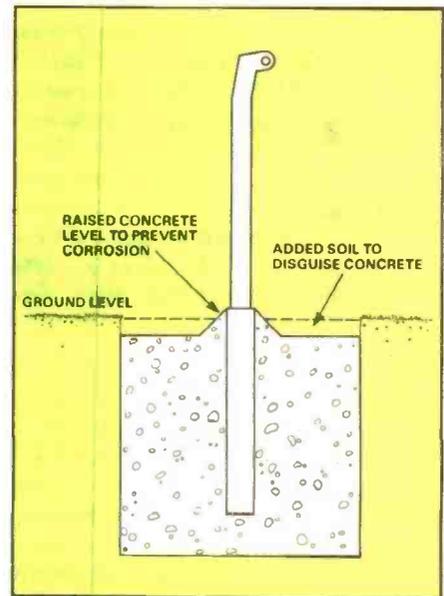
Concrete positioned below the ground level with a raised area around the ground post sleeve.
